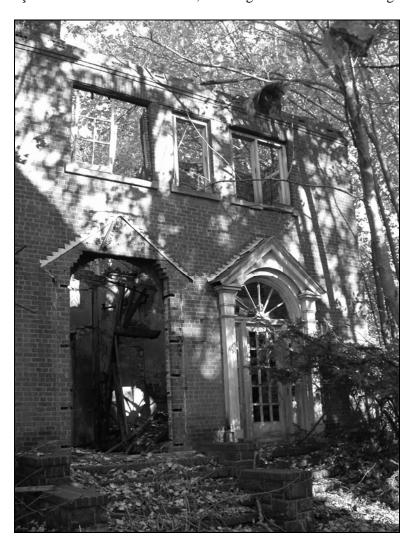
South and west façades of circa 1955 addition, facing northeast.
